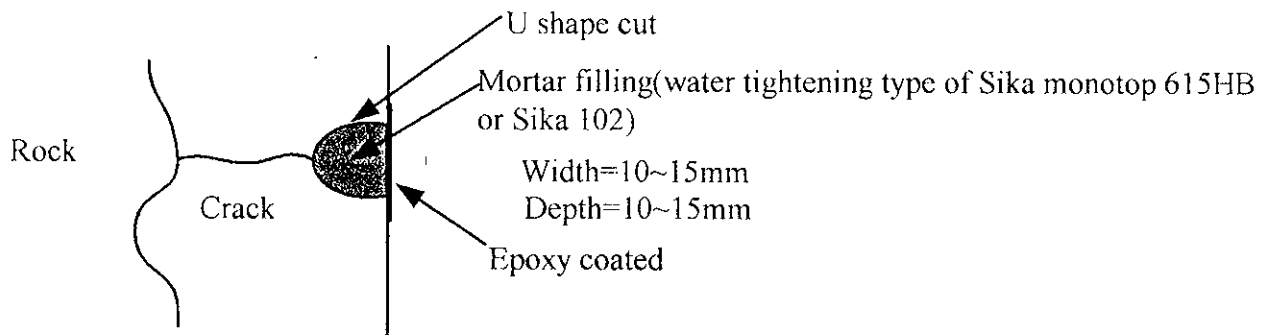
Method of Repair of Cracks in Longitudinal and Cross Sectional Directions
